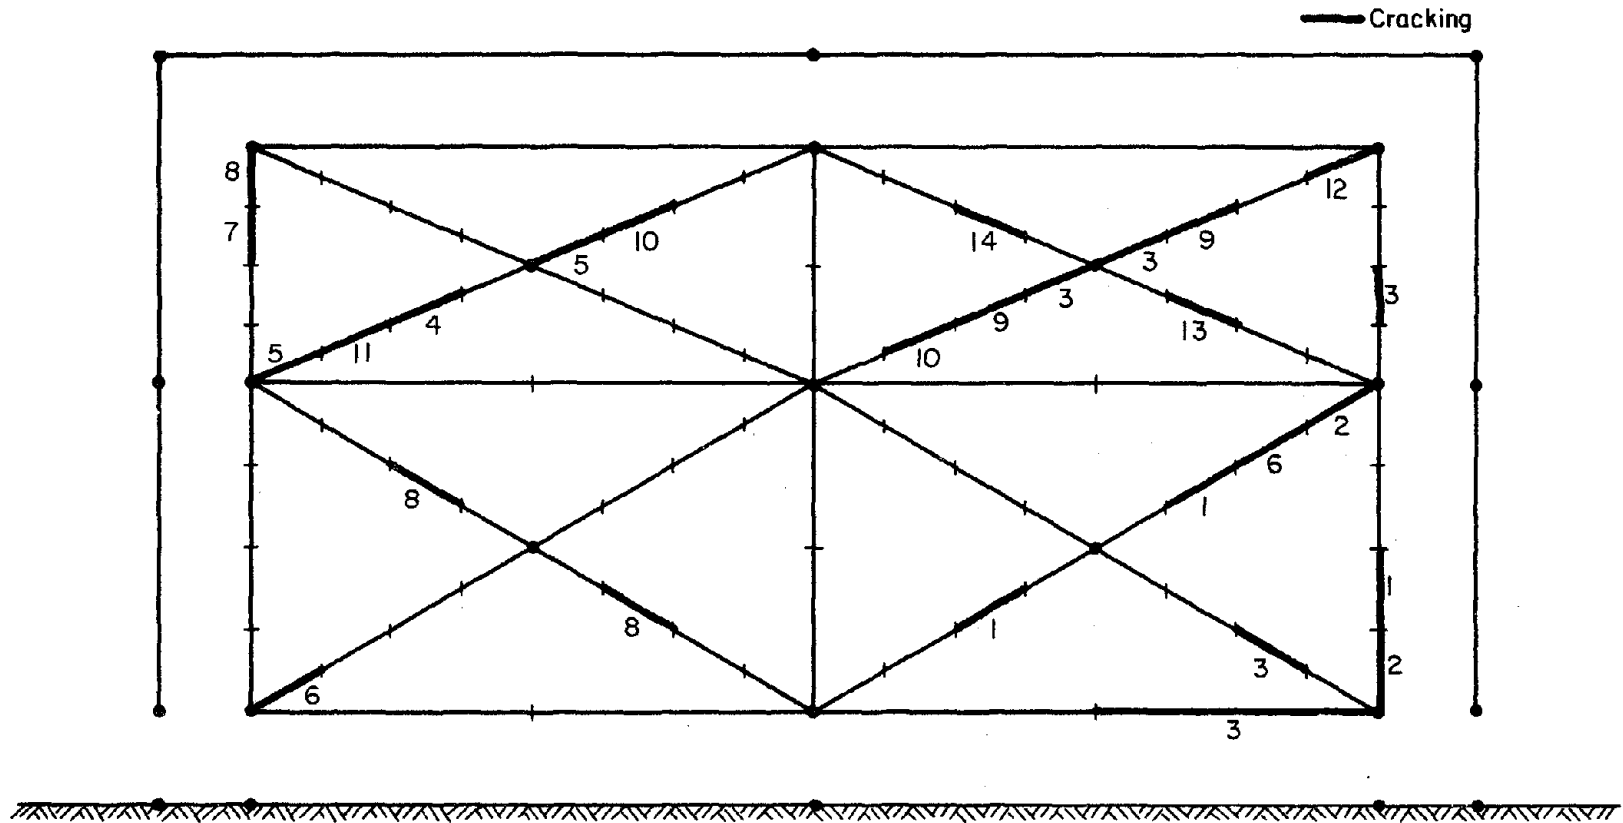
Cracking Sequence: Frame Wall from t=0.275 to 0.555 sec
